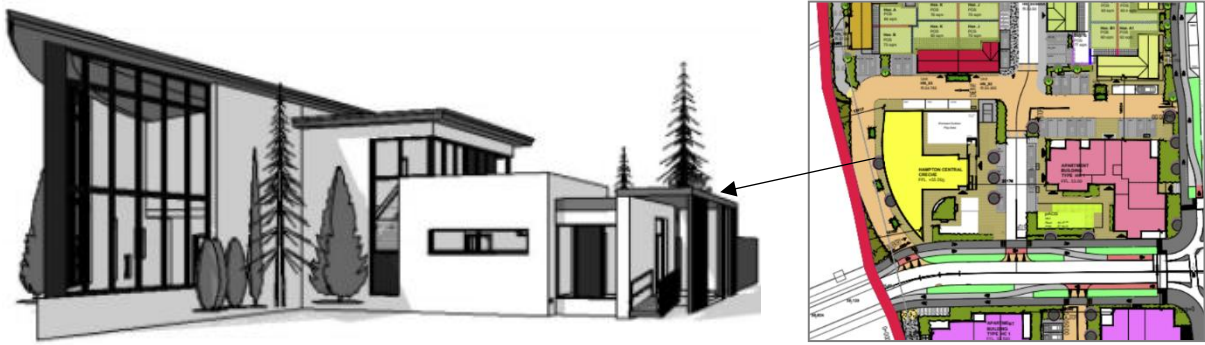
3D view and plan extract of the proposed Hampton North Creche.
